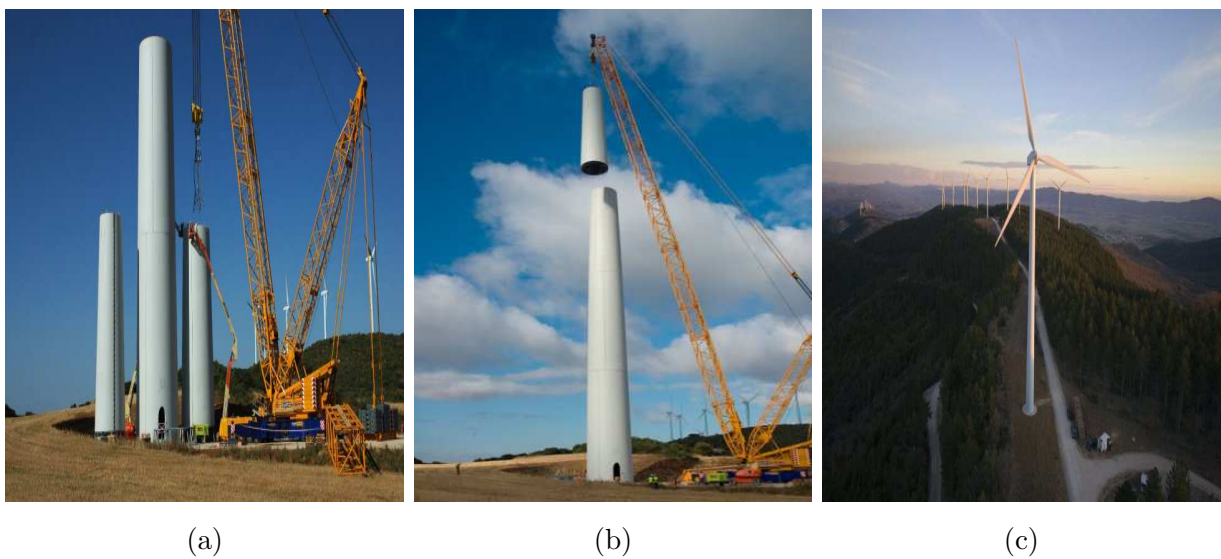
Inneo towers in assembly process, taken from [18]; (a) working environment; (b) tower erection; and (c) assembled wind turbine
